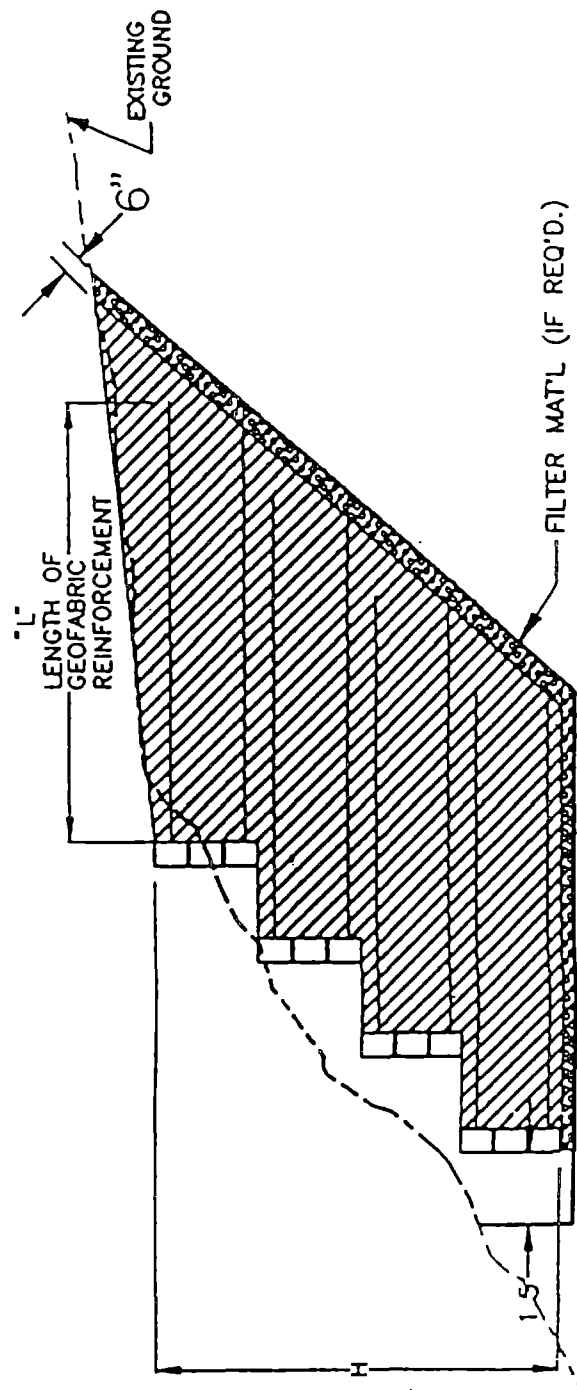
A timber-faced GRS wall with filter material at bottom and back.
